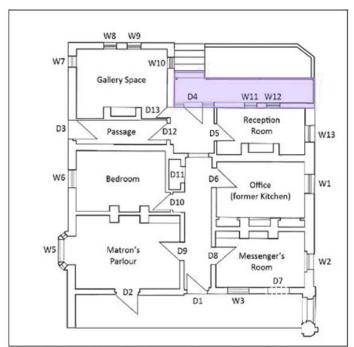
Floor Plan (Port Arthur Historic Sites, 2020)
